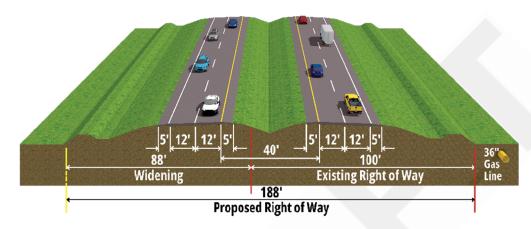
S.R. 60 PREFERRED TYPICAL SECTION 2 (EAST OF PRAIRIE LAKE ROAD TO WEST OF KENANSVILLE ROAD)
